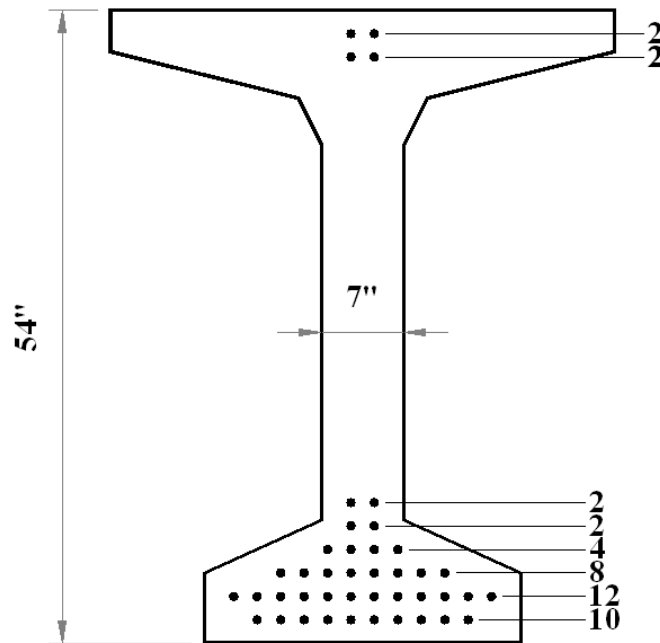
End View Cross-Section of Eight BT-54 Girders with 42-0.6 in. (15 mm) Strands Employing UHPC.
